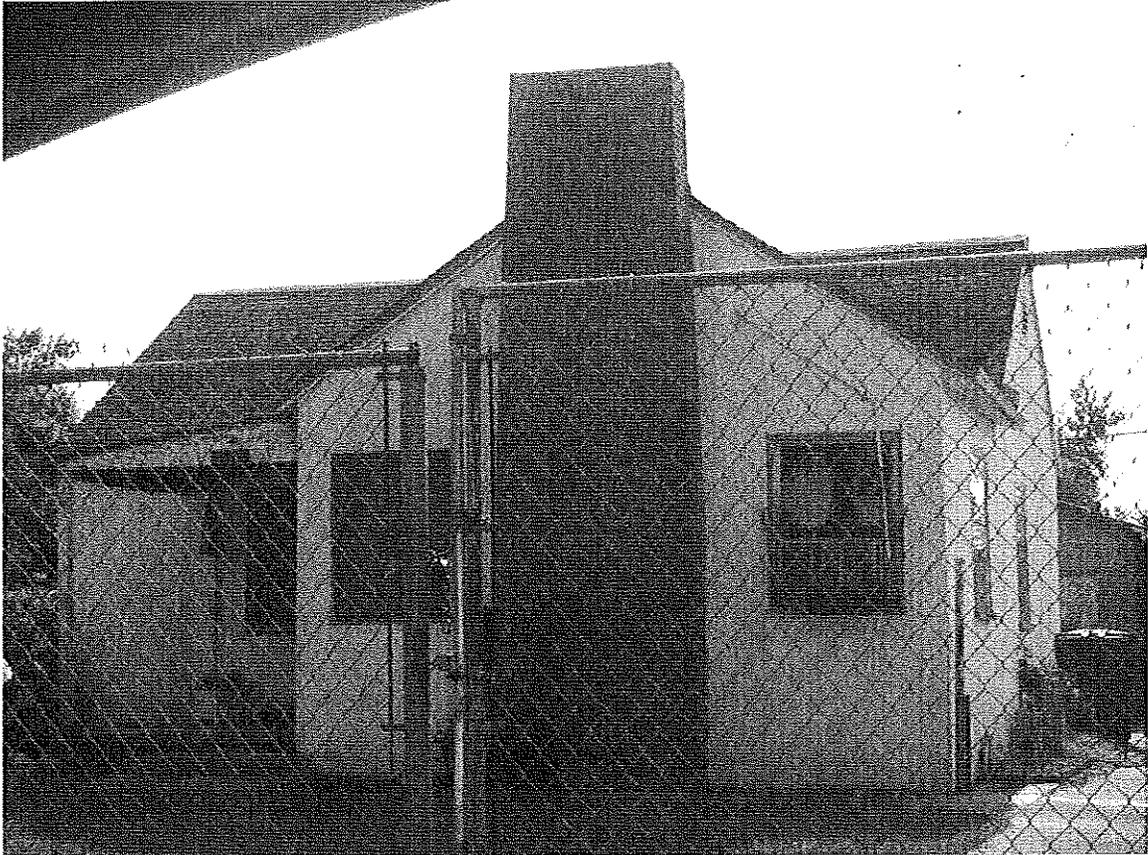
3900 Block of Haywood Avenue, APN 251 0023 016: The exterior of this home is damaged and deteriorating. Wood paneling above the doorway is cracked. Two front windows are boarded with wood.
